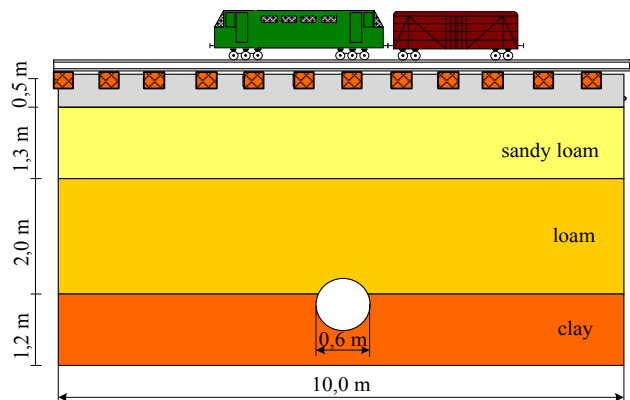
Schematic of the geometric cross-section of reinforced subgrade
